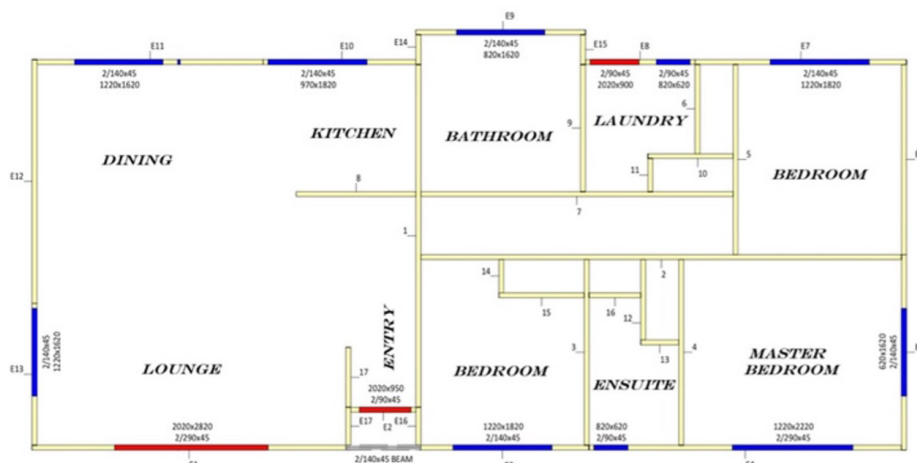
Simplified house plan design for use in detailing analysis (modified from original).
